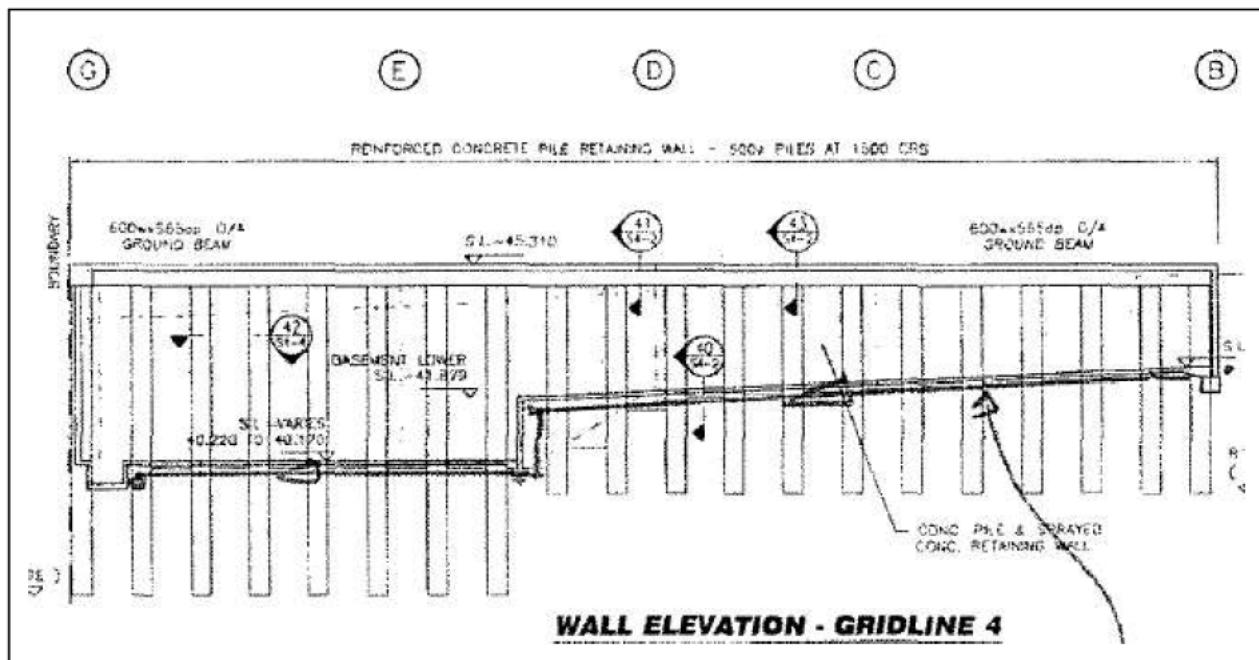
Drawing Extract – Concrete pile wall elevation, 2006
